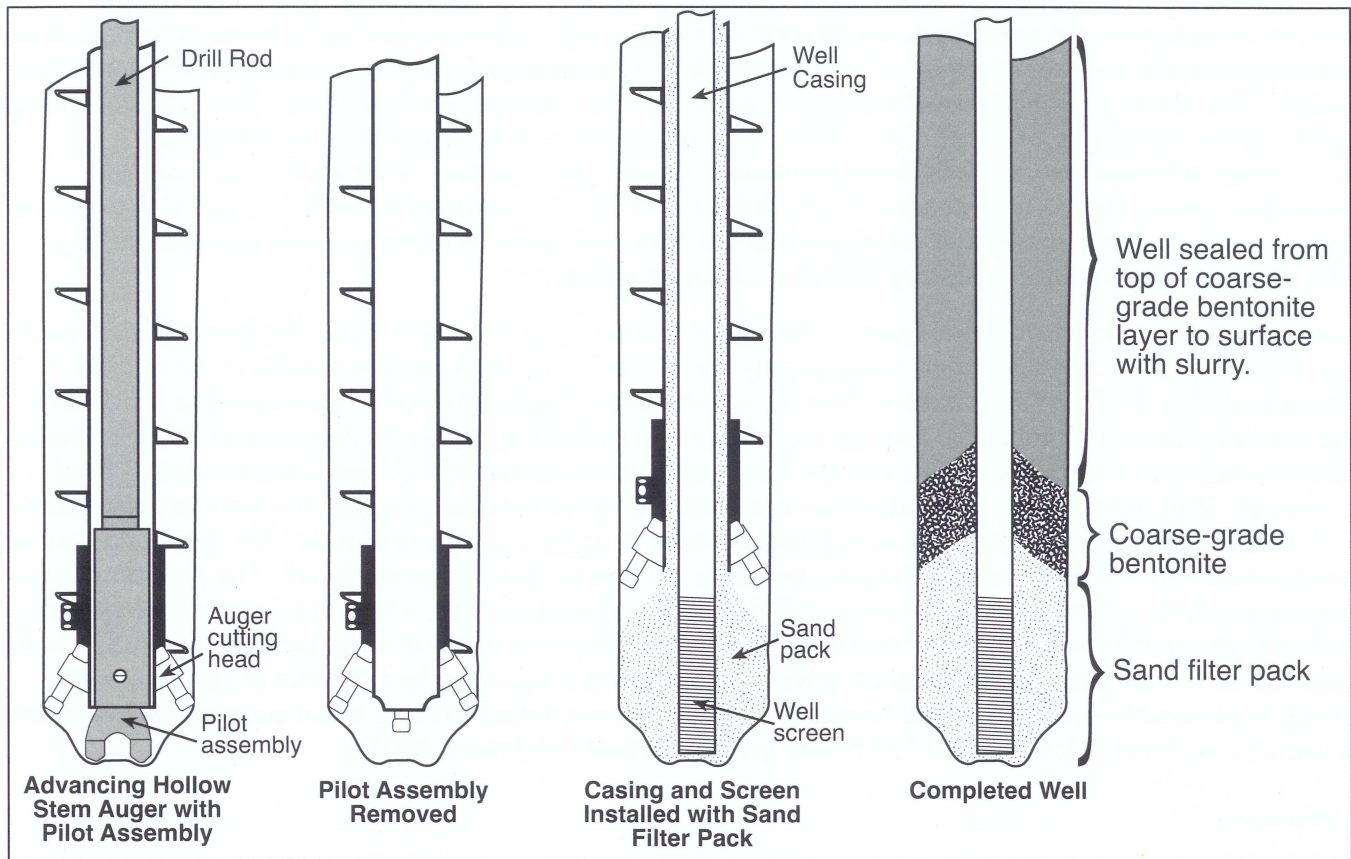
Well construction using hollow stem augers. (Modified from Hackett, 1987)
